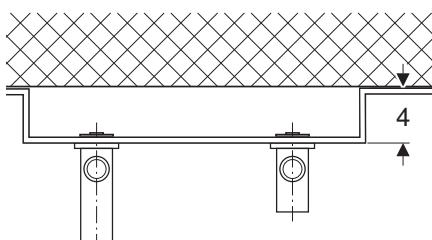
Installation dimension for exposed installation with a Geberit mounting plate, offset
